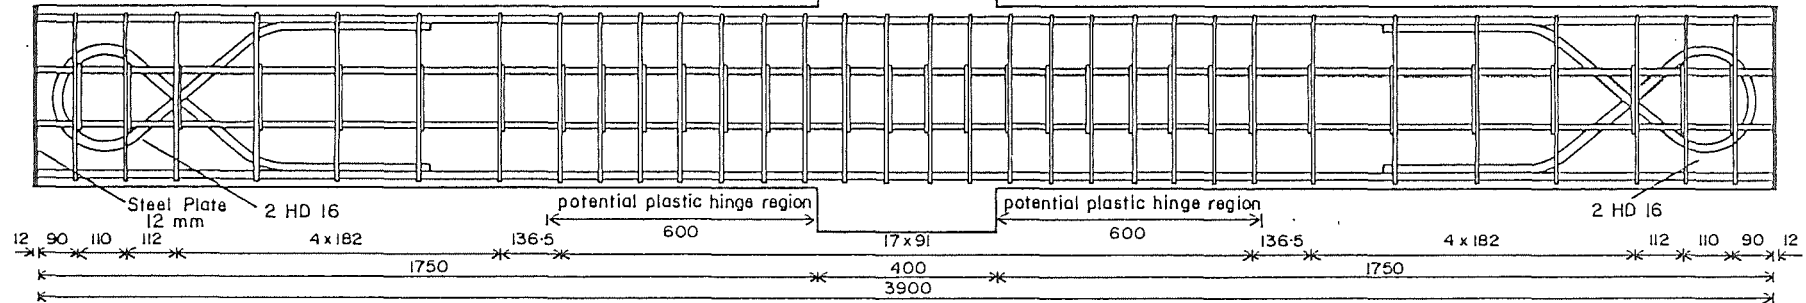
THE ARRANGEMENT OF REINFORCEMENT IN UNITS 1 AND 2
